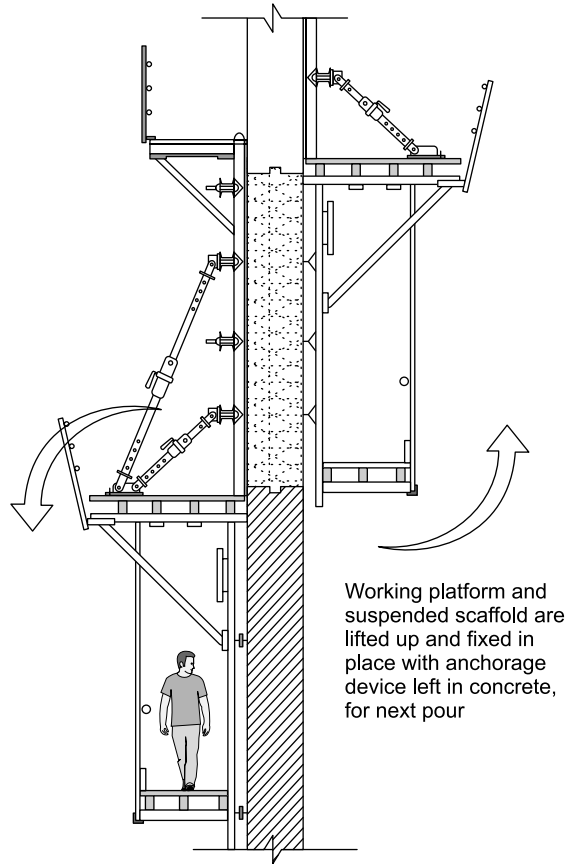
(c) Fixing of Suspended Scaffold to Receive the Wall Formwork for Third Lift.
